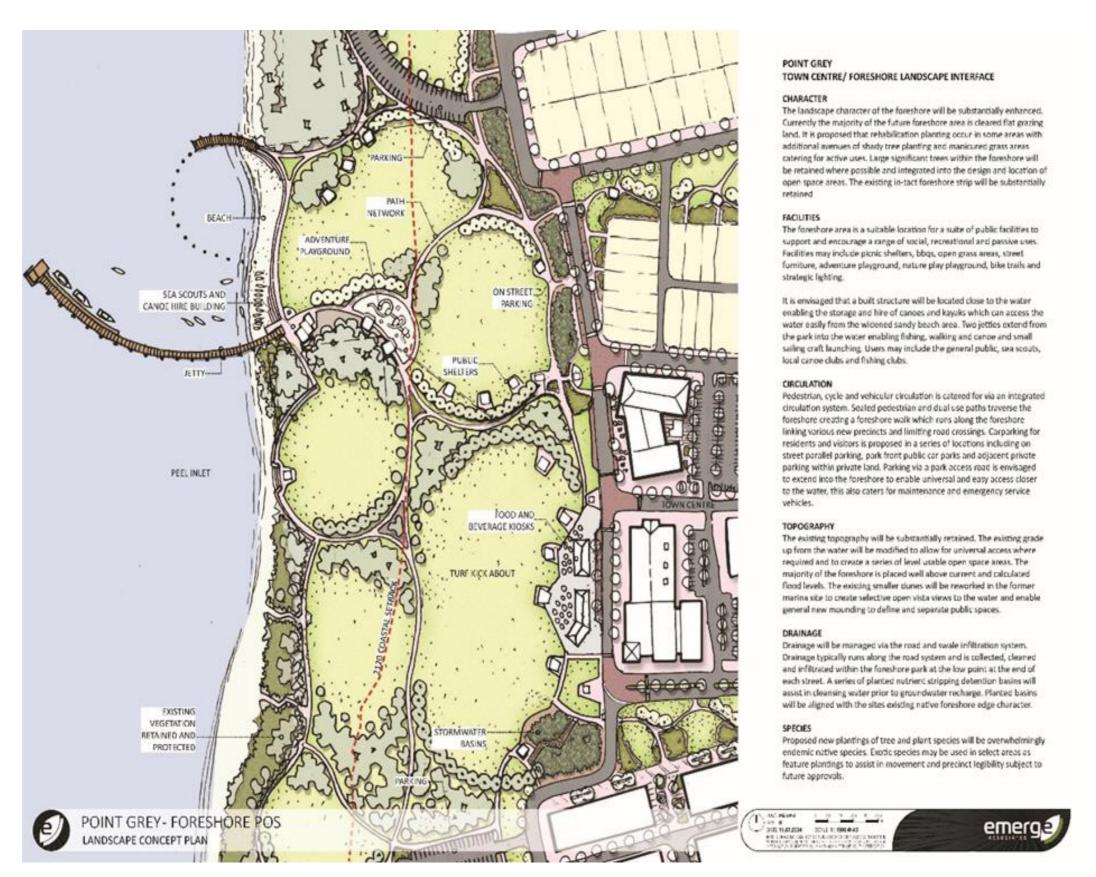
Point Grey landscape Concept Plan showing the proposed location and concept design for the two proposed jetties
